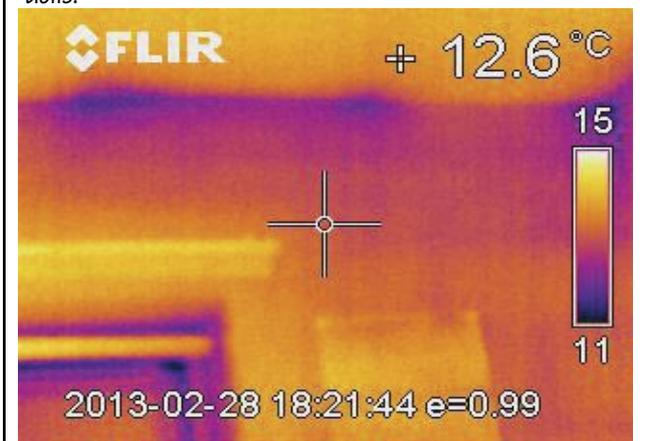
and 2, even though the door was within a porch there were cold spots around the door and at the ceiling wall junction.
